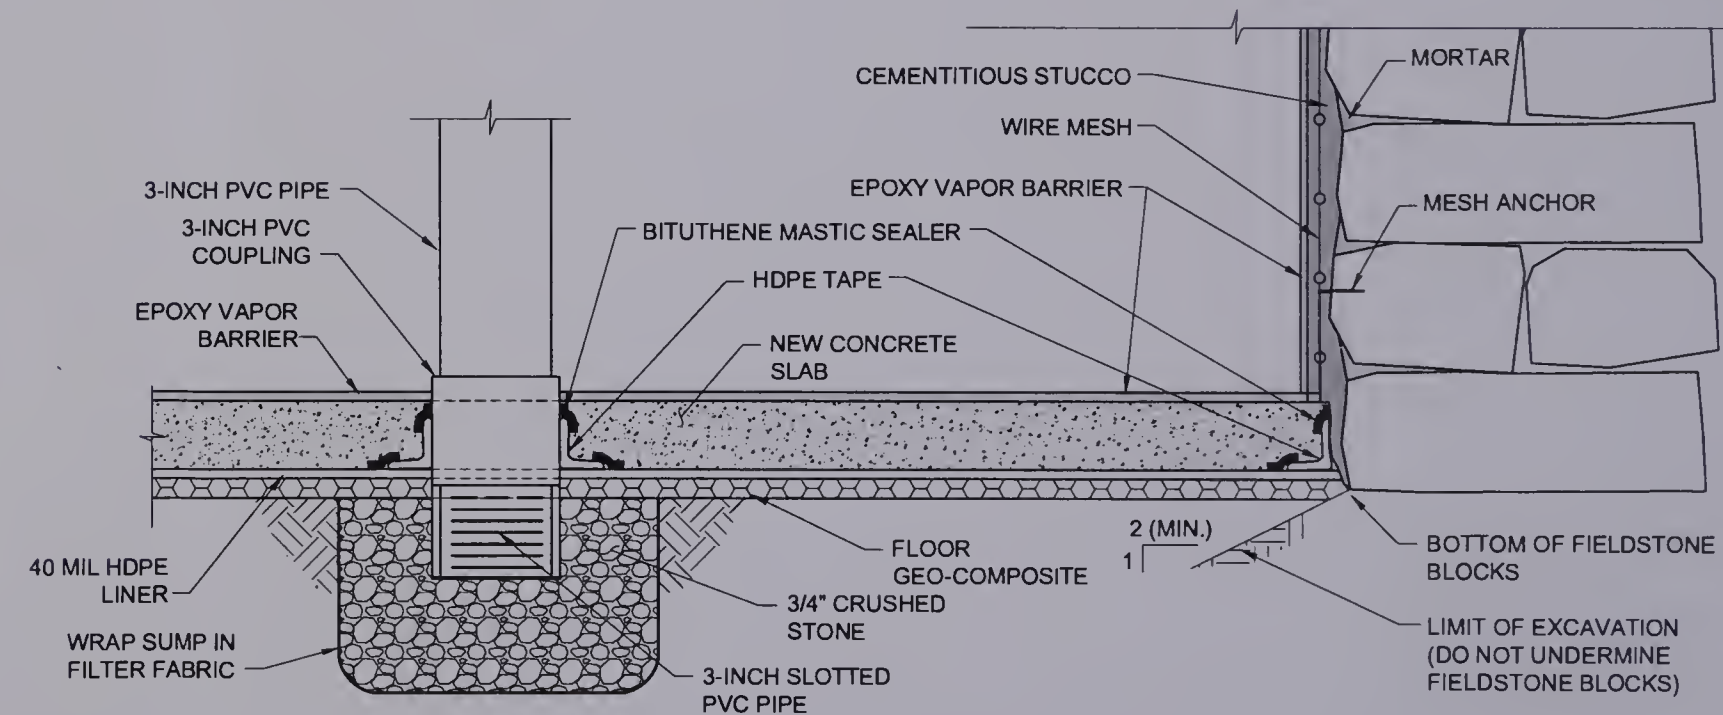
DETAIL - BASEMENT SLAB VAPOR BARRIER SYSTEM
